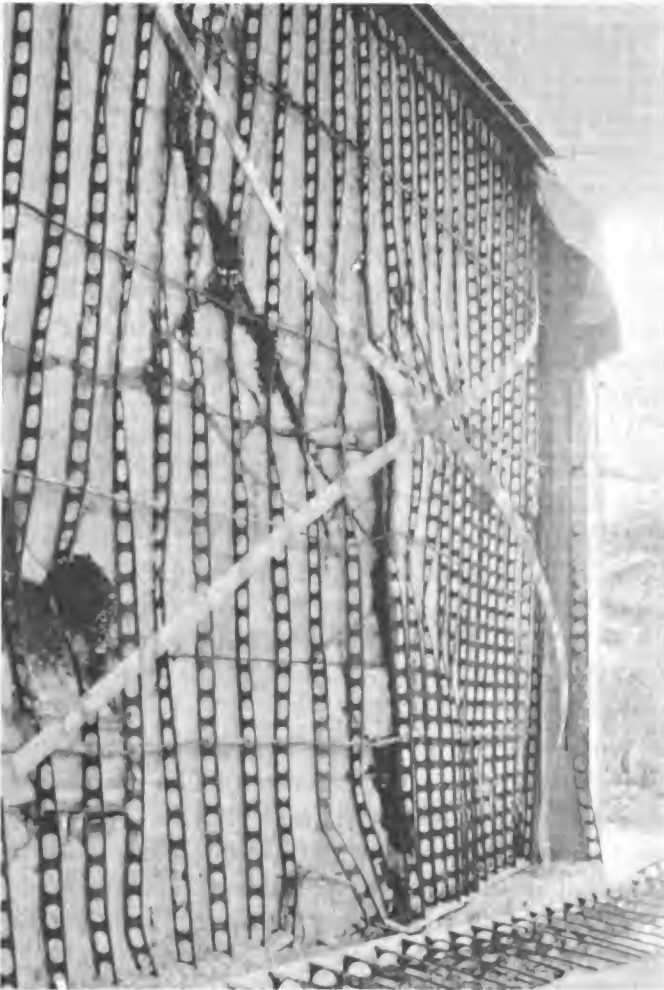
Olive View Hospital, heating and refrigeration plant. Excessive deformation of diagonal bracing shown in figure 76. Vertical crack in plaster wall was caused by shifting of equipment within the building, as seen in figure 84.
